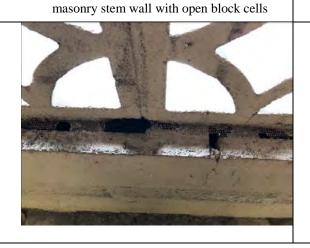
Ventilated architectural block and masonry stem wall exhibiting settlement cracks
